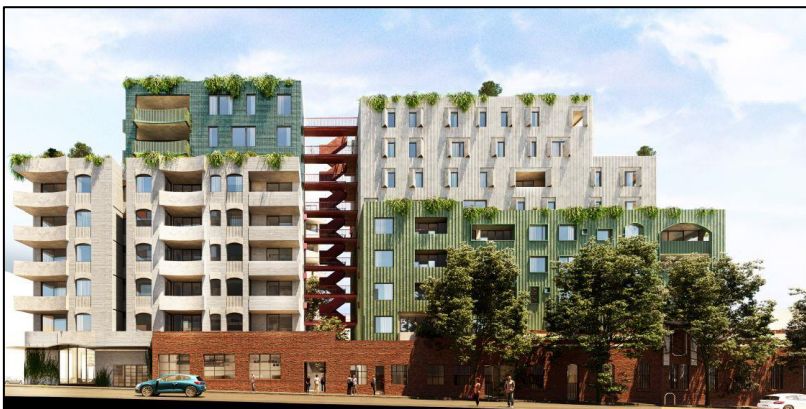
Current - Gore Street Façade (SJB Architects September 2021)
